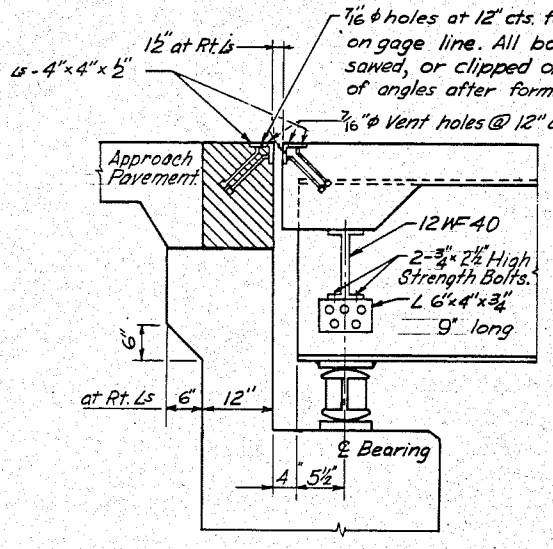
DETAIL OF OPEN EXPANSION DEVICE AT ABUTMENTS
